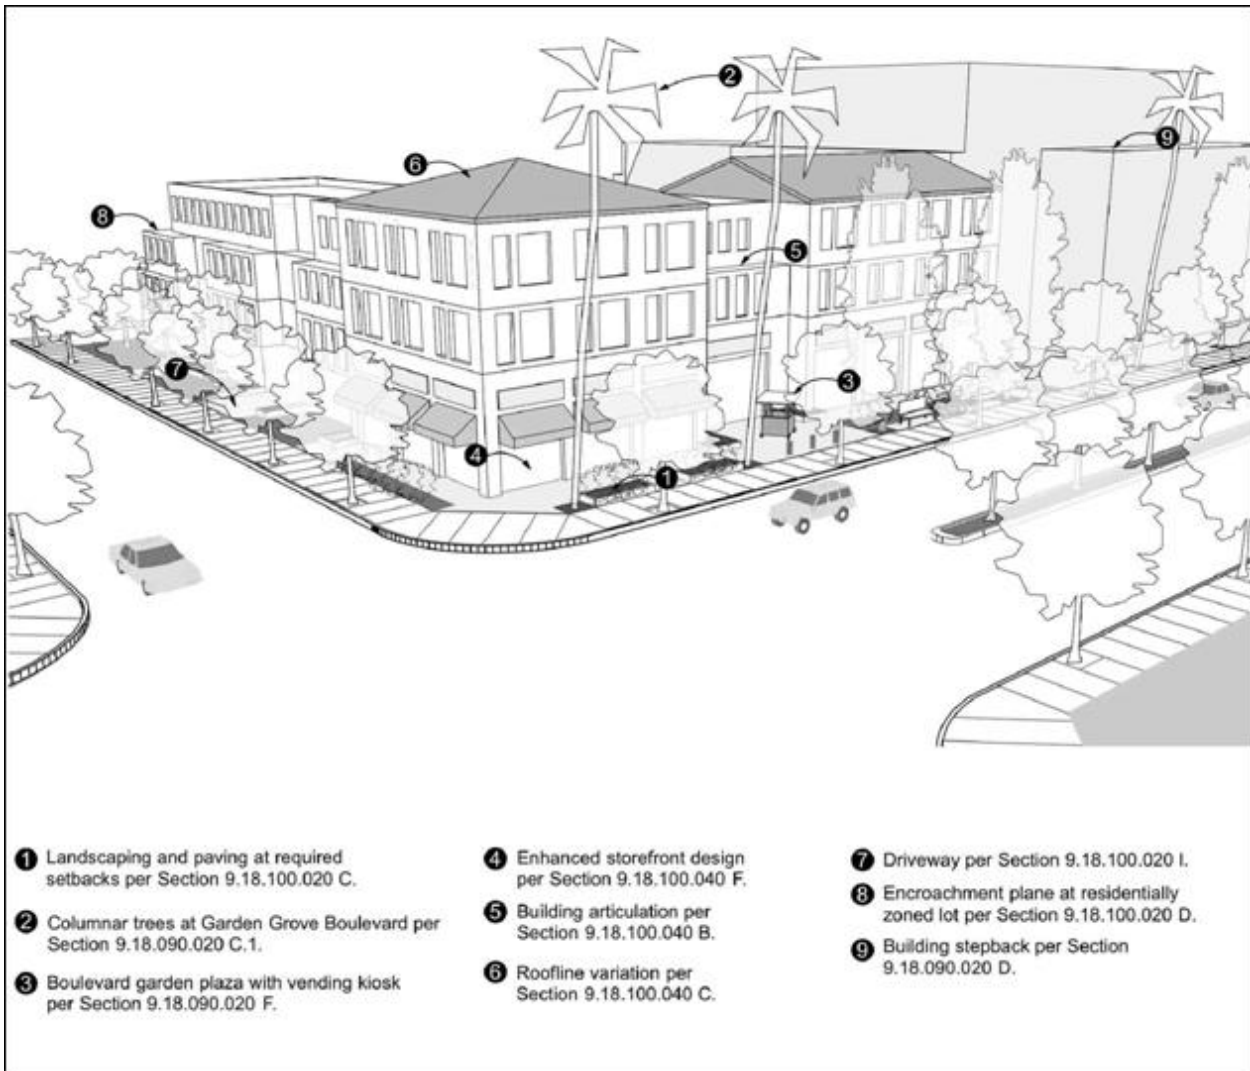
Garden Grove Boulevard Mixed Use Zones Rendering
